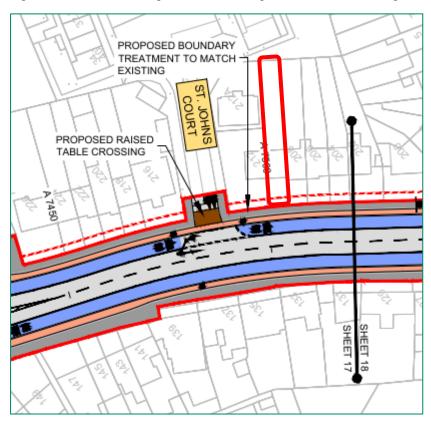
Proposed new Layout at 210 Malahide Road
